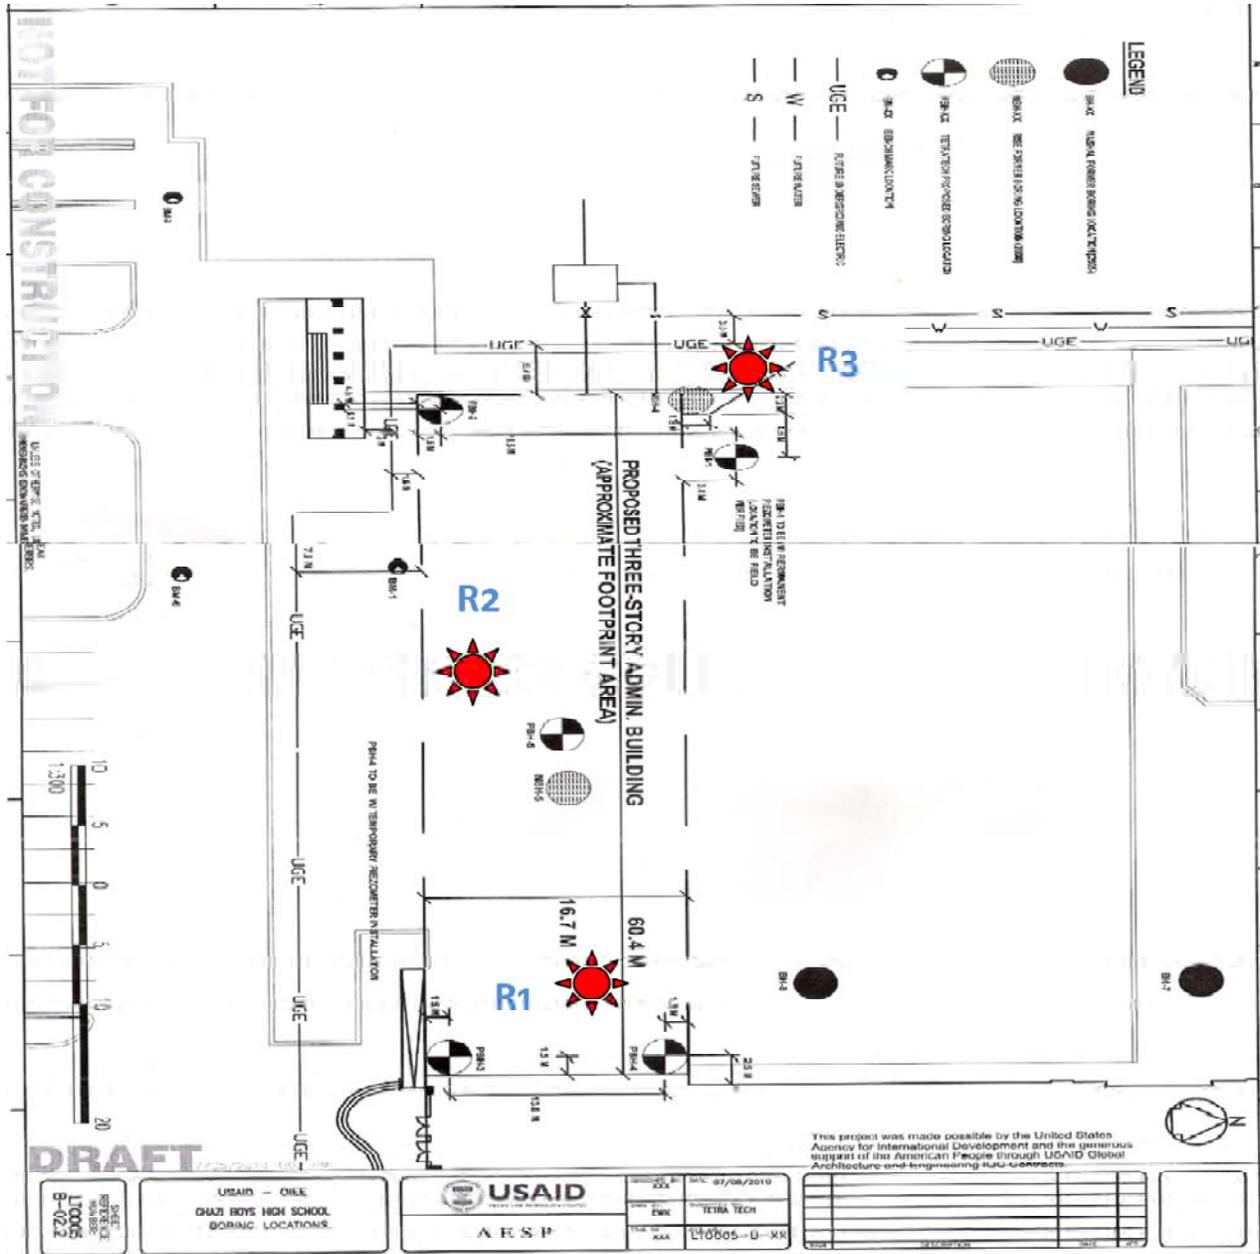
Sounding locations on the proposed building site (Ghazi High School)
